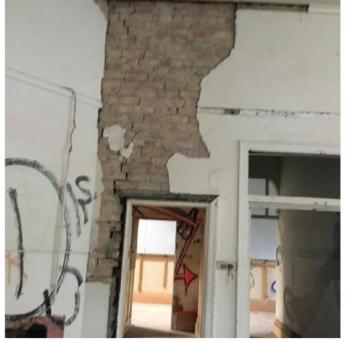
Large cracking at internal wall, room 1/6 interface
